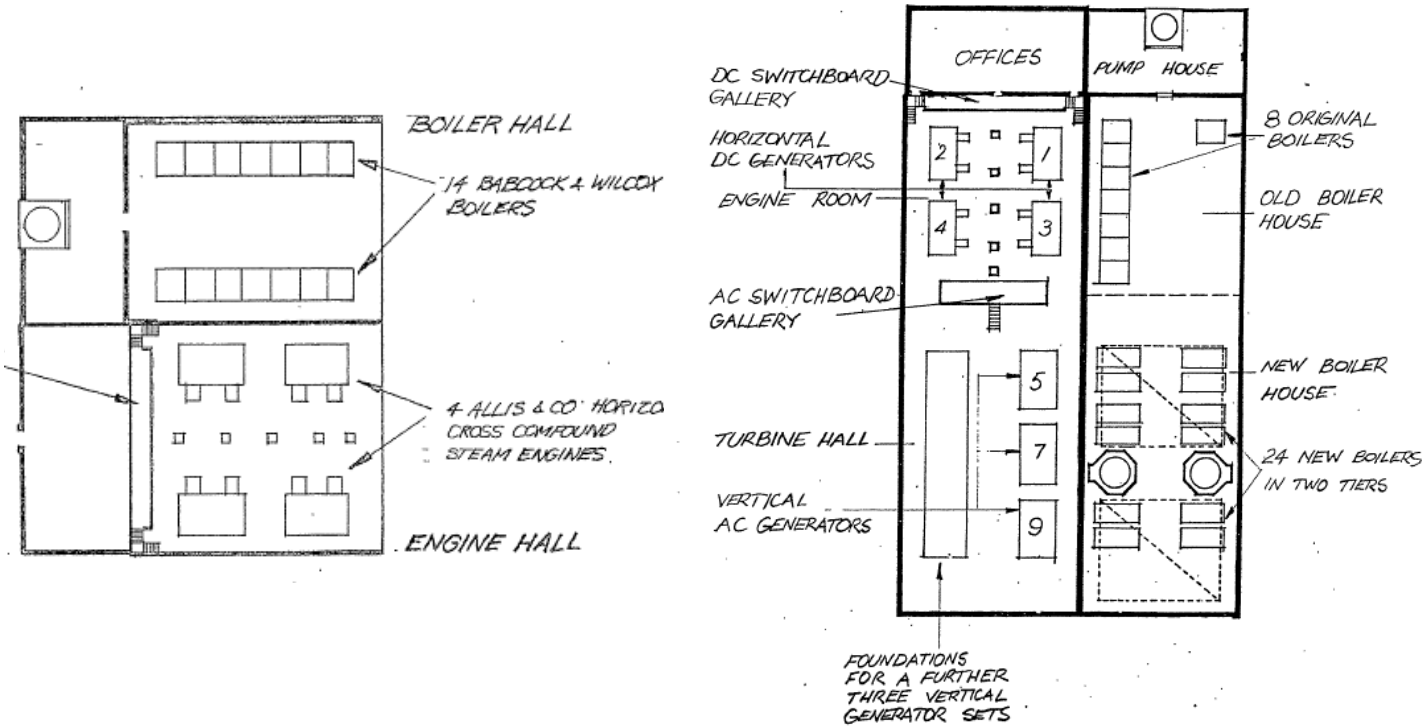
1899 Layout of the Power House layout (left) and 1902 (right). (Source: Godden et al. 1984 p. 98 and 104)
